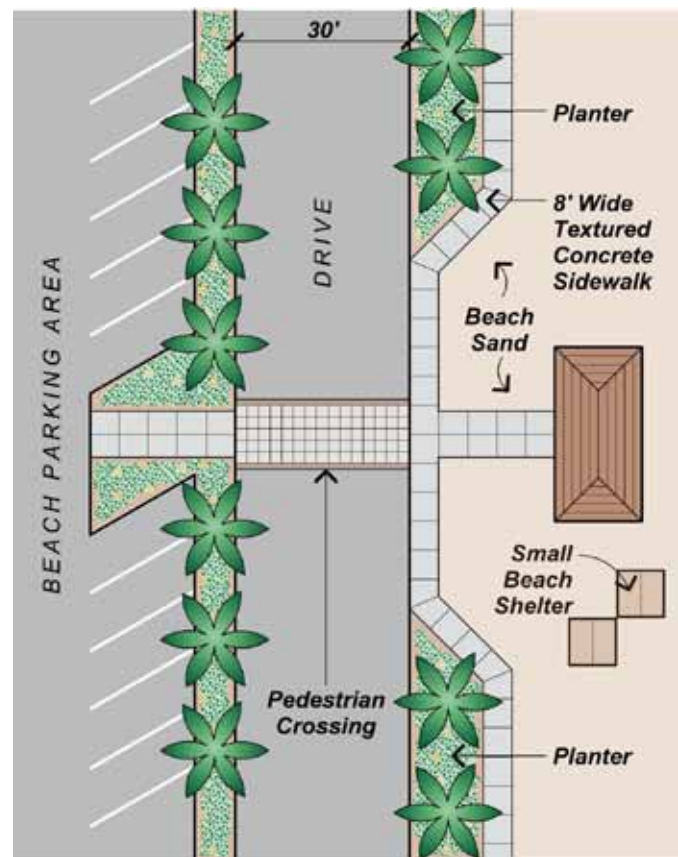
Typical north/south sidewalk detail at Del Mar Beach.
